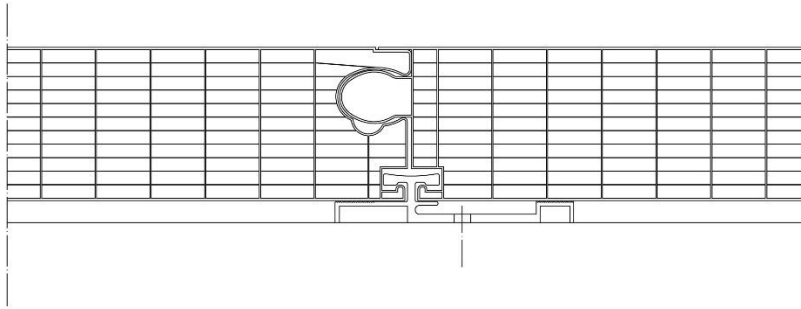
Example for multi-layer sheet with lift anchor/aluminium fastener (section)
